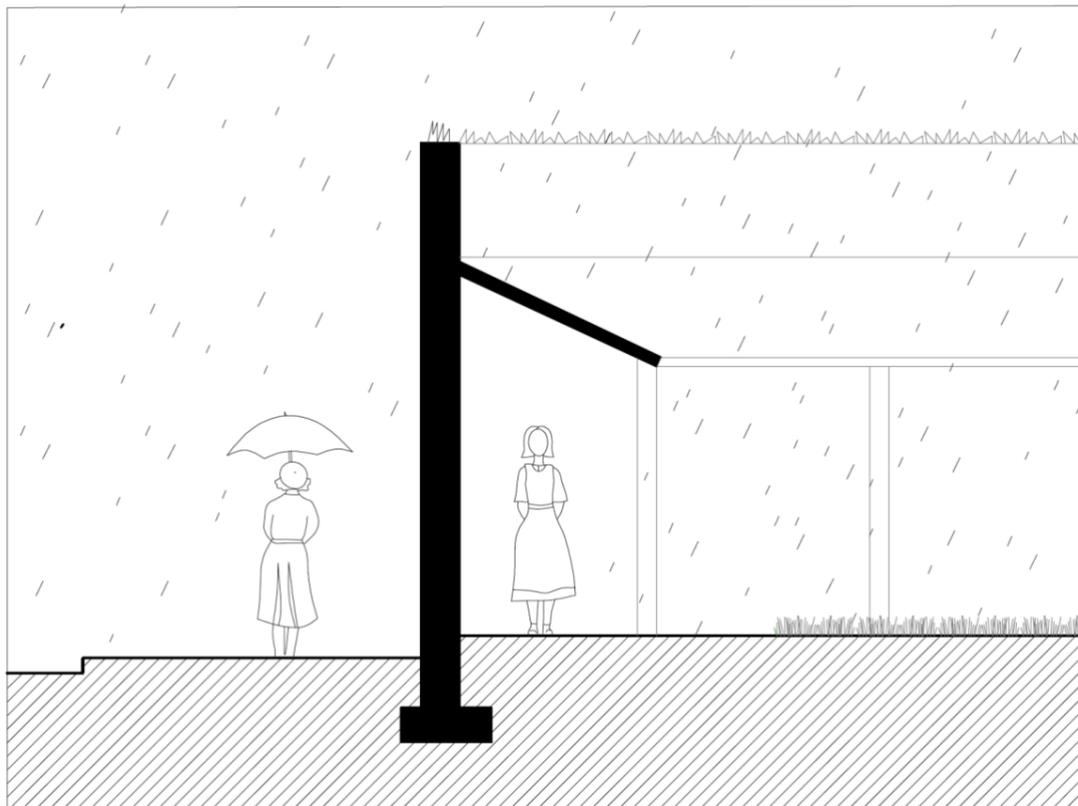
Section of Cloister at Railway St side(Source: Author's Own Drawing)
